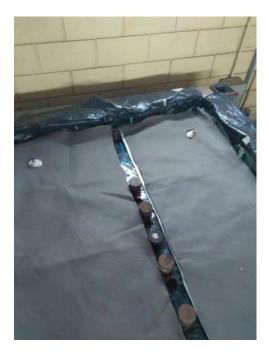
Non-woven geotextile sheets placed over airbags to minimize friction with plywood boards.
